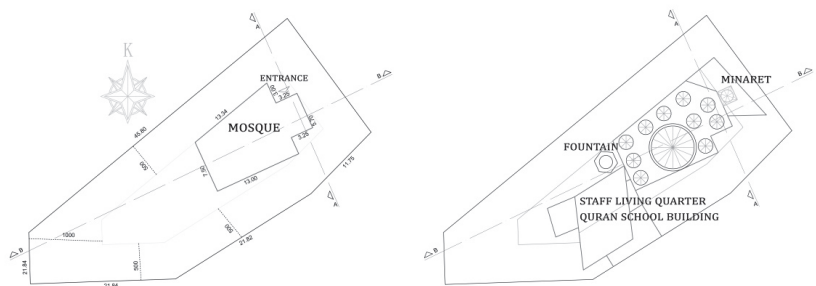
Layout plan for the construction permit of Imam Azam Mosque and its current status.
